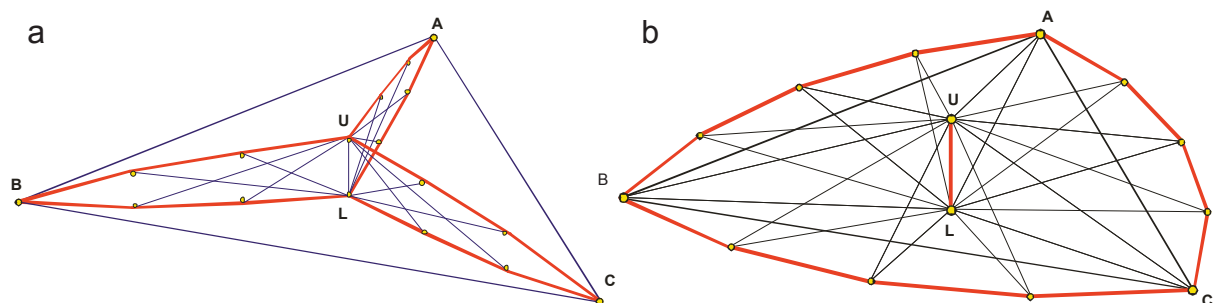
a) Spatial form of new type of lenticular girder called system MT, b) another form of this girder called system D
